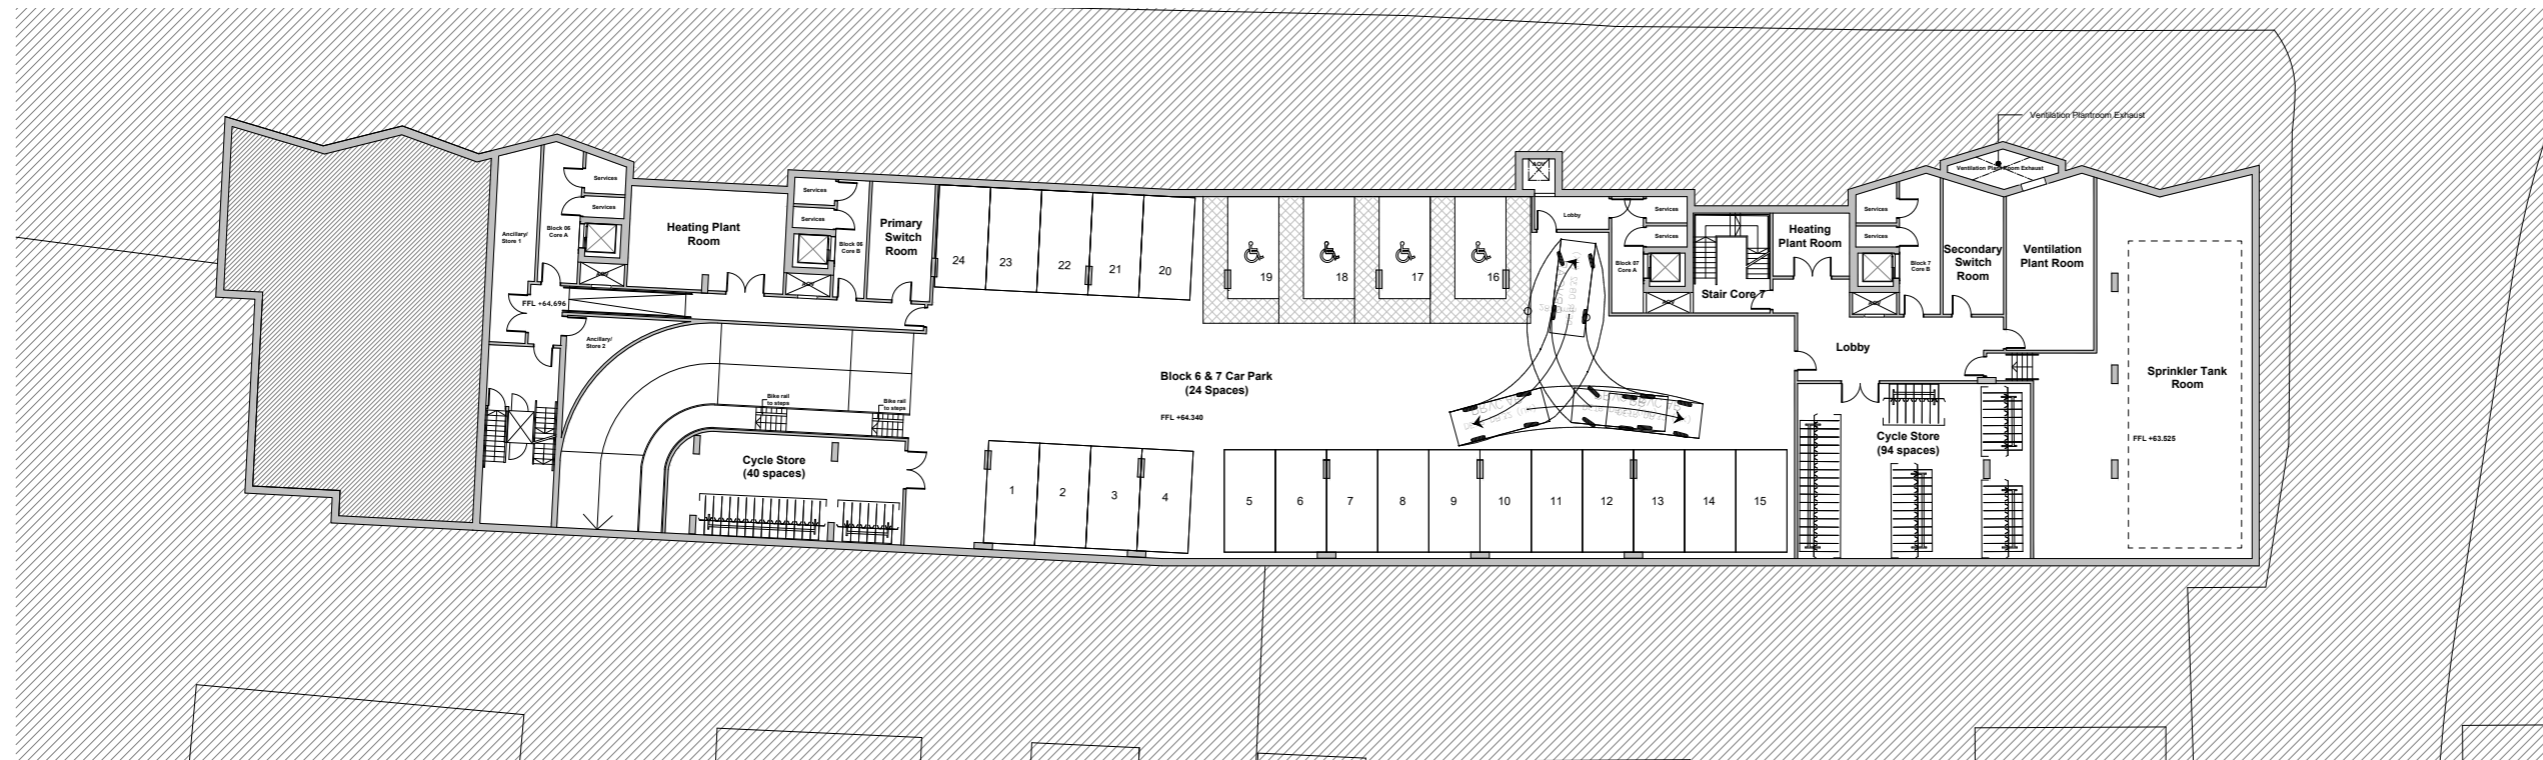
Block 6 & 7 Basement Floor Plan as proposed
